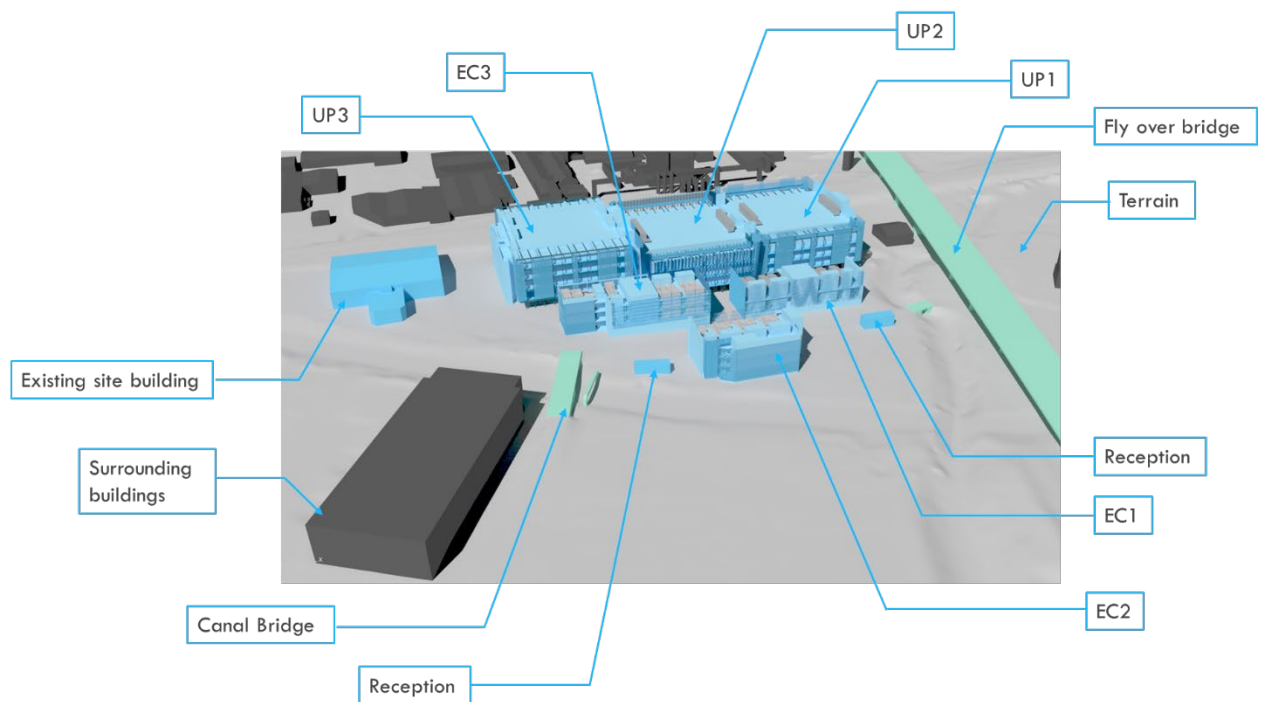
North close-up perspective view of the modelled existing site and surrounding buildings.
